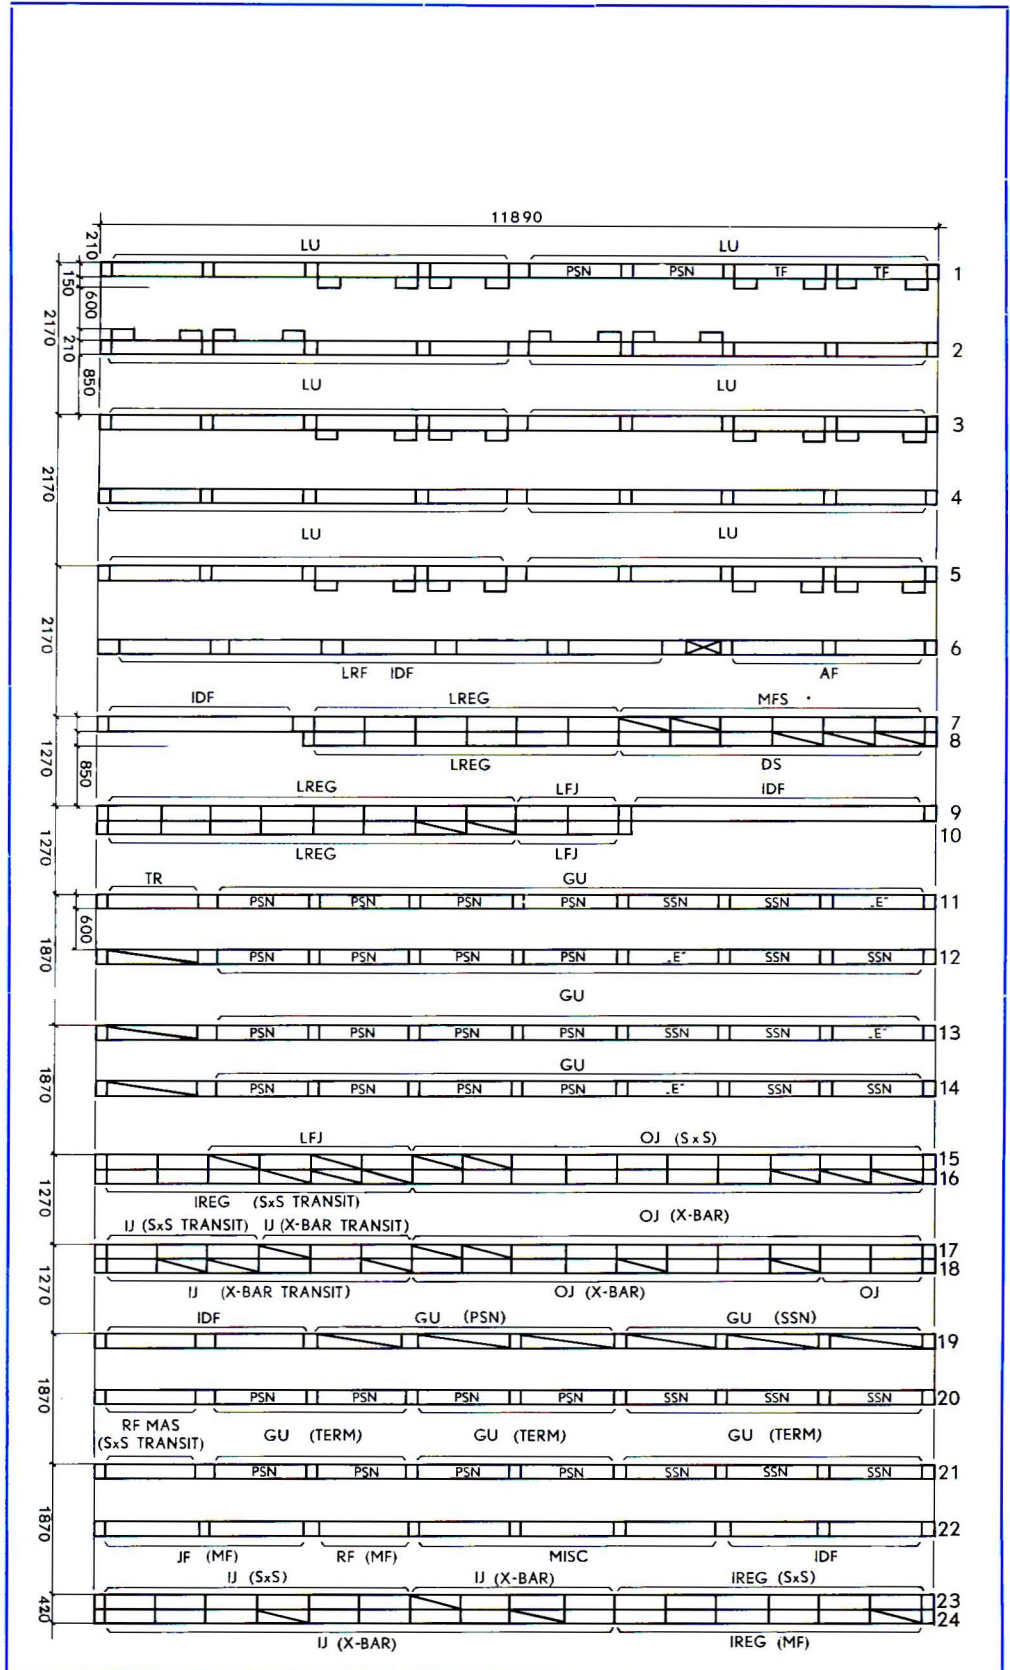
Floor plan layout for 10 000 line Pentaconta local exchange
